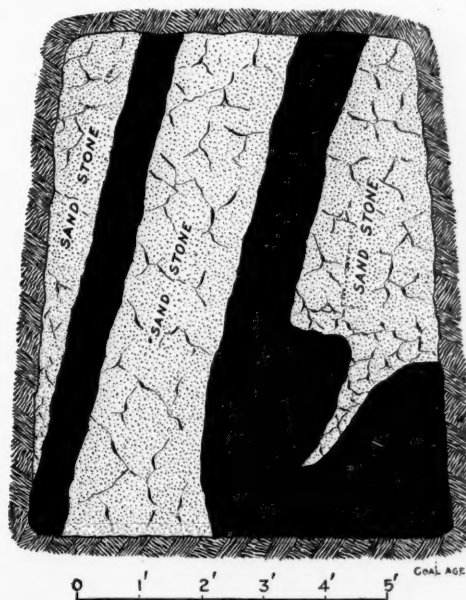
FACE OF TUNNEL, SHOWING COAL AND BROKEN SANDSTONE
